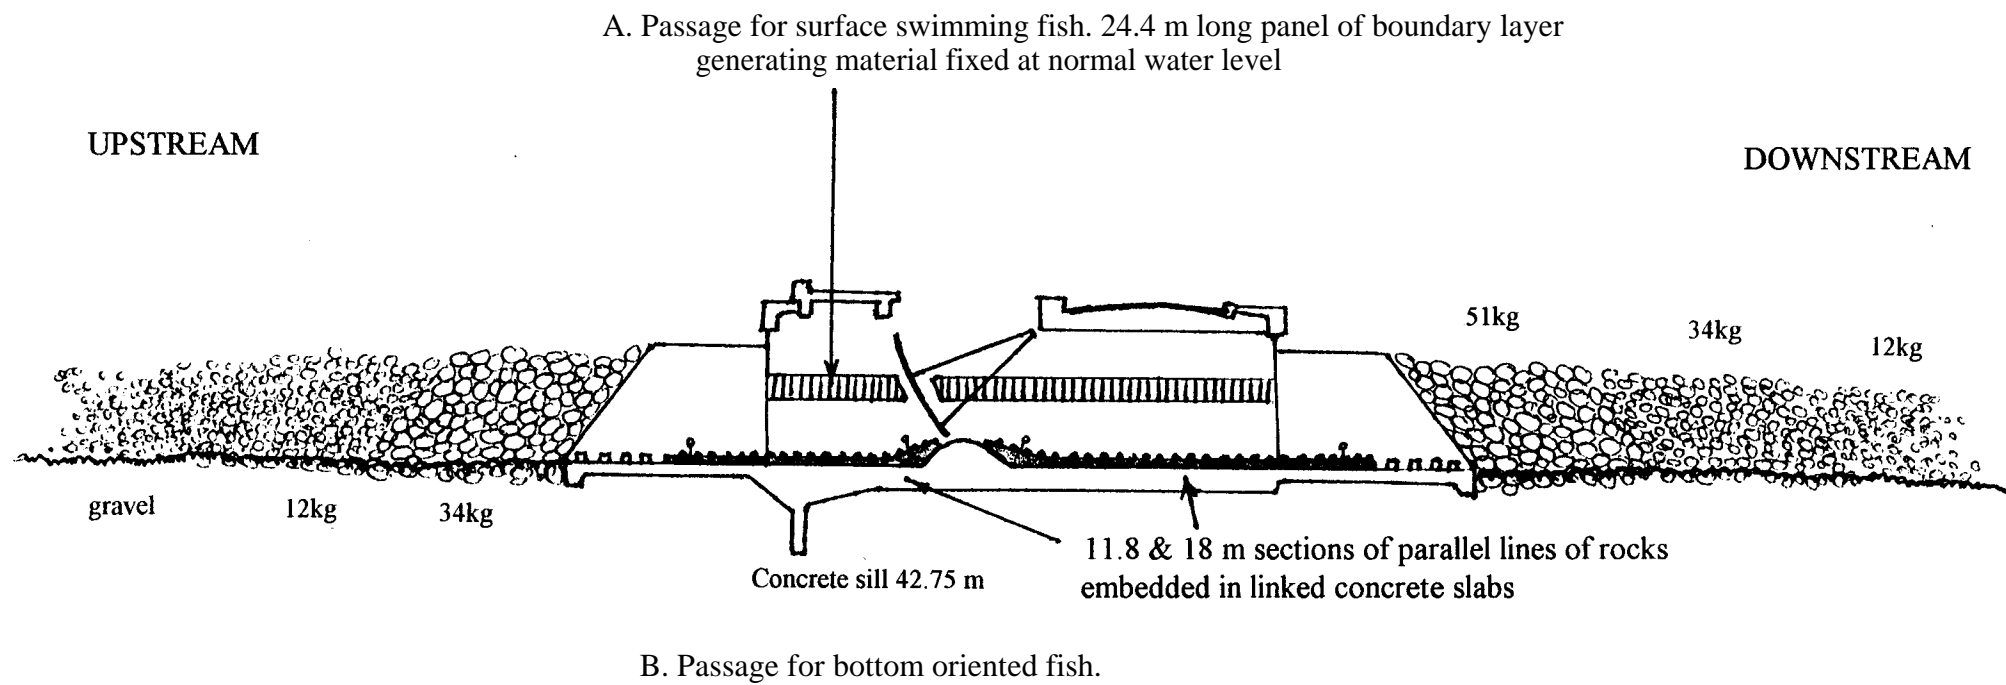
Section through Lake Wairarapa control structure showing fish passage facilities.
